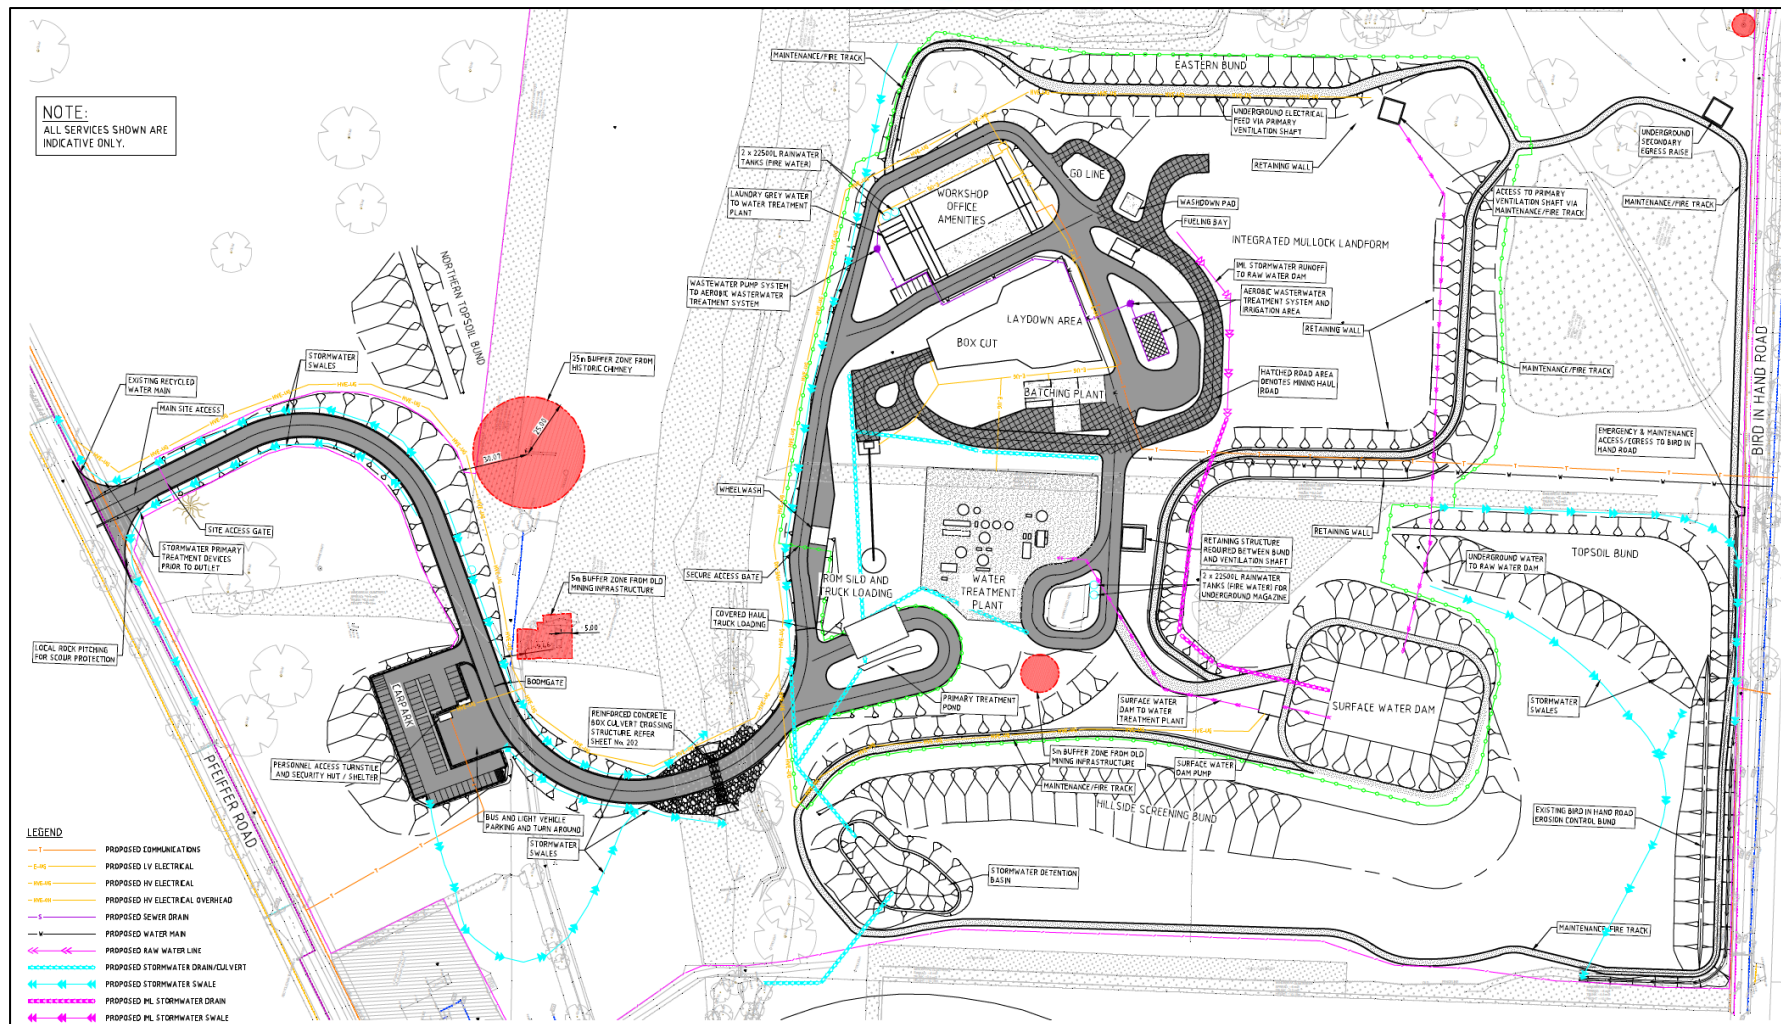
Proposed Site design – Appendix B1 of the Mining Proposal
